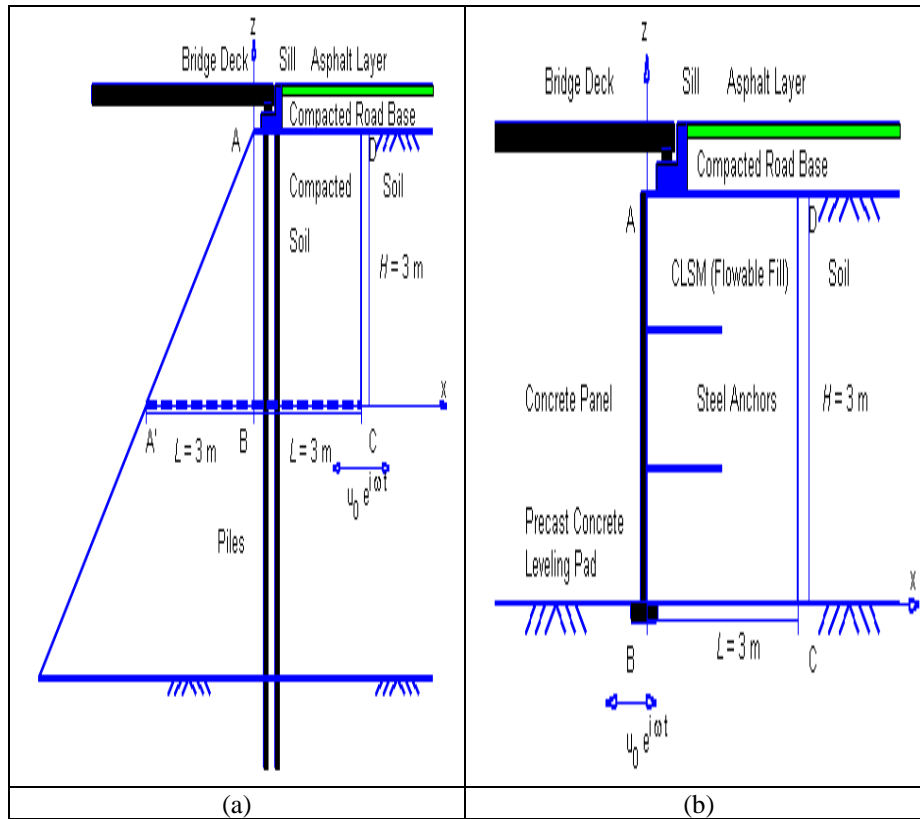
Schematic of bridge abutments: (a) conventional bridge abutment using compacted soil with pile foundations (b) CLSM abutment with concrete panel and steel anchors.
